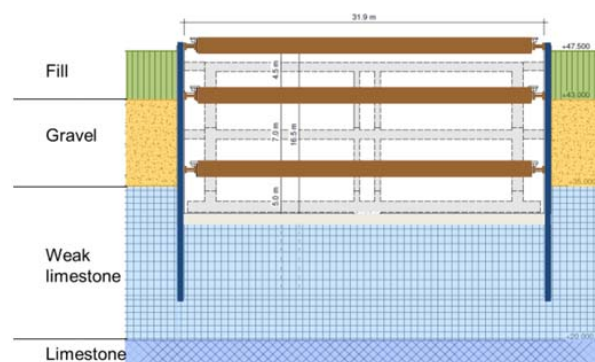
Cross section of the building pit with struts and girders. The final construction is represented with dashed lines.
